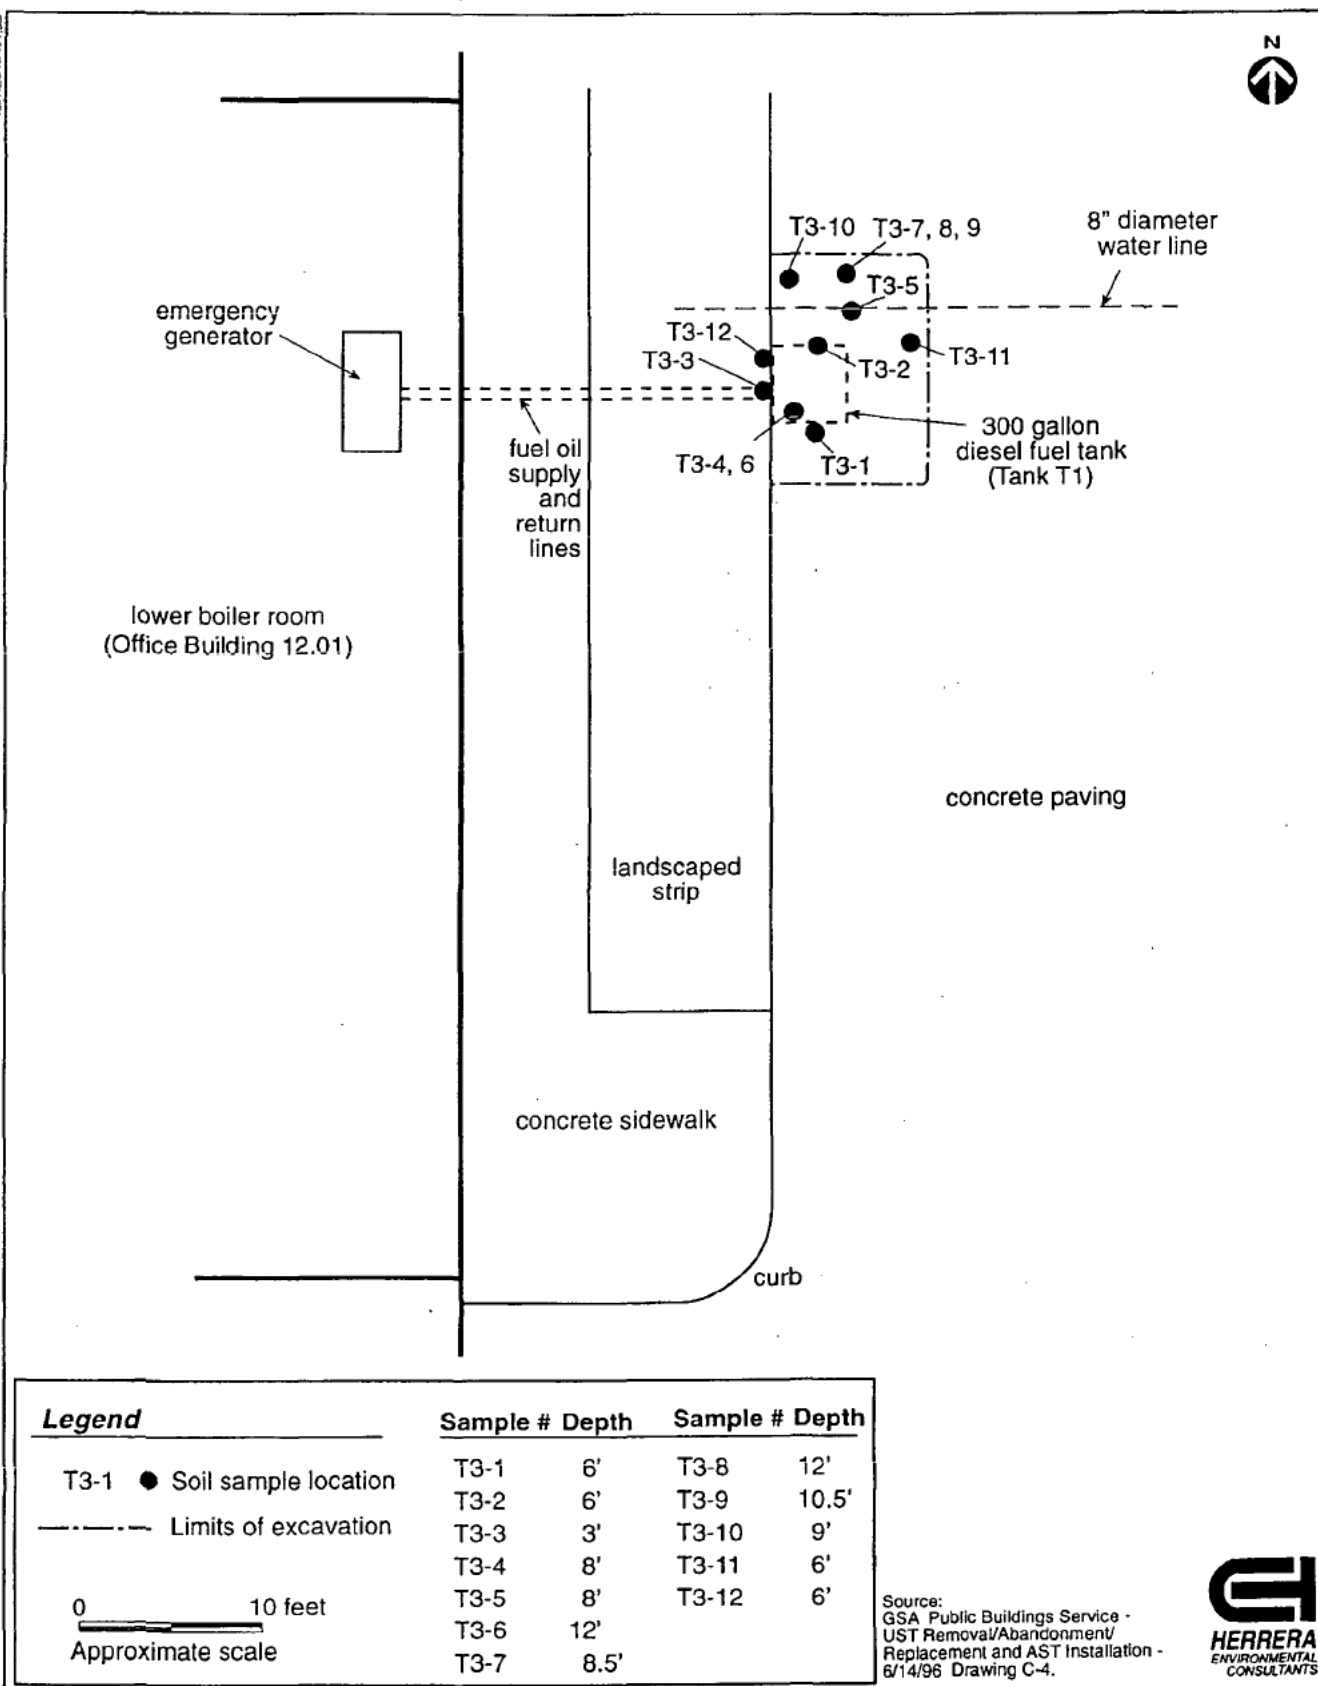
Tank T1 location map, Building 12.01 at Federal Center South, Seattle, Washington.
